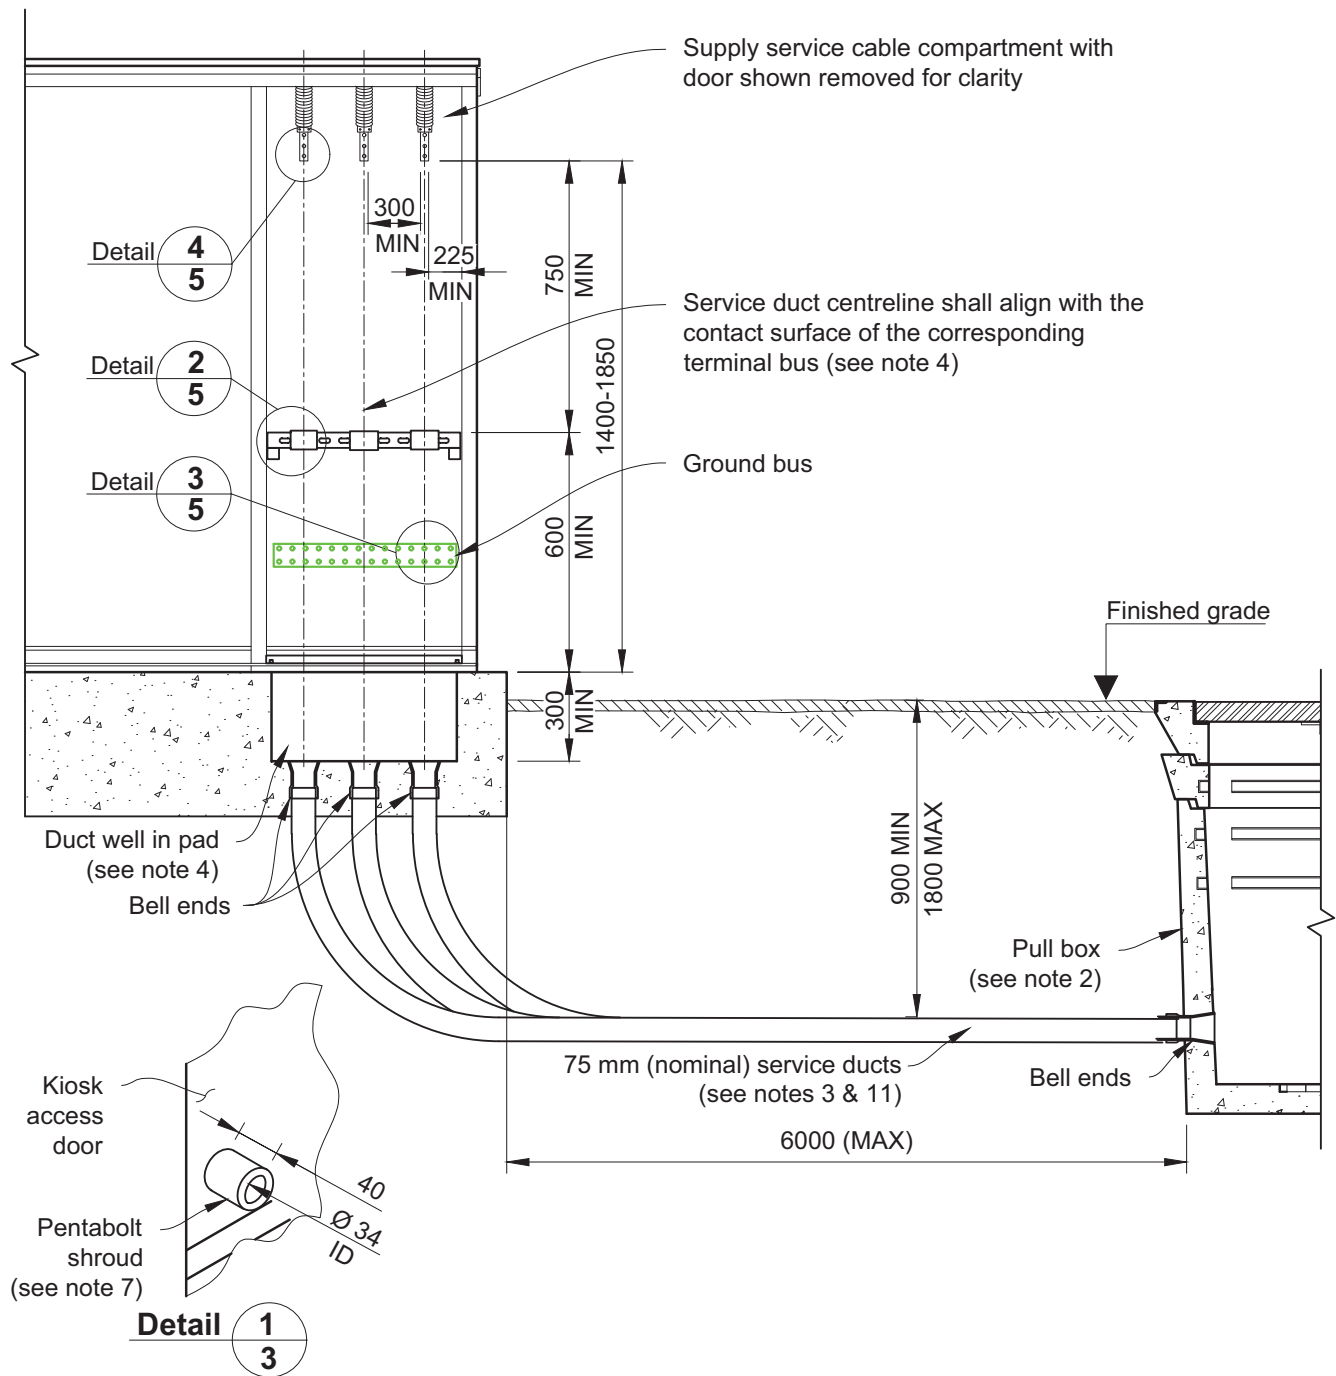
Typical live-front outdoor kiosk, rear elevation
